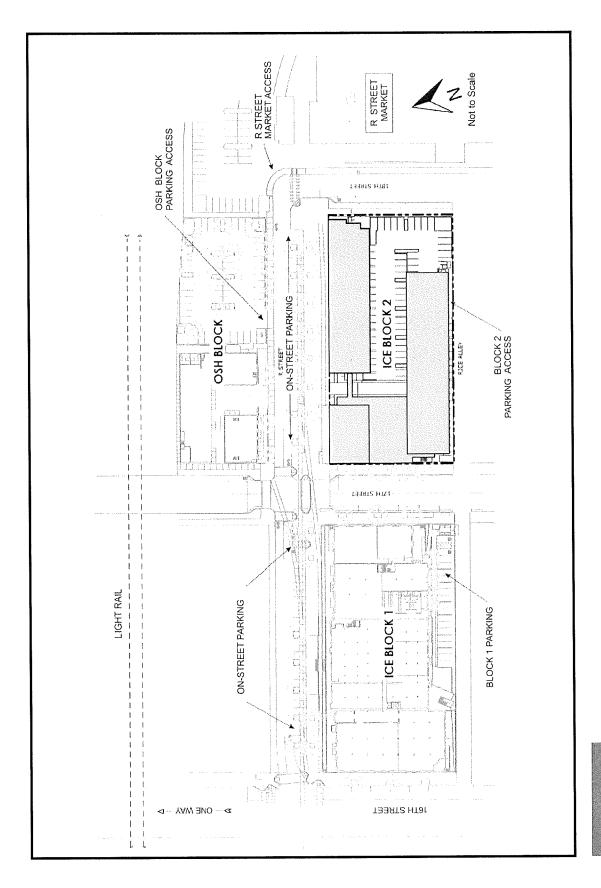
illustrates the site plans. Block 1 would include parking along Rice Alley. Block 2 would include on-site parking, with access from Rice Alley. The OSH Block would include on-site parking with access from R Street.
